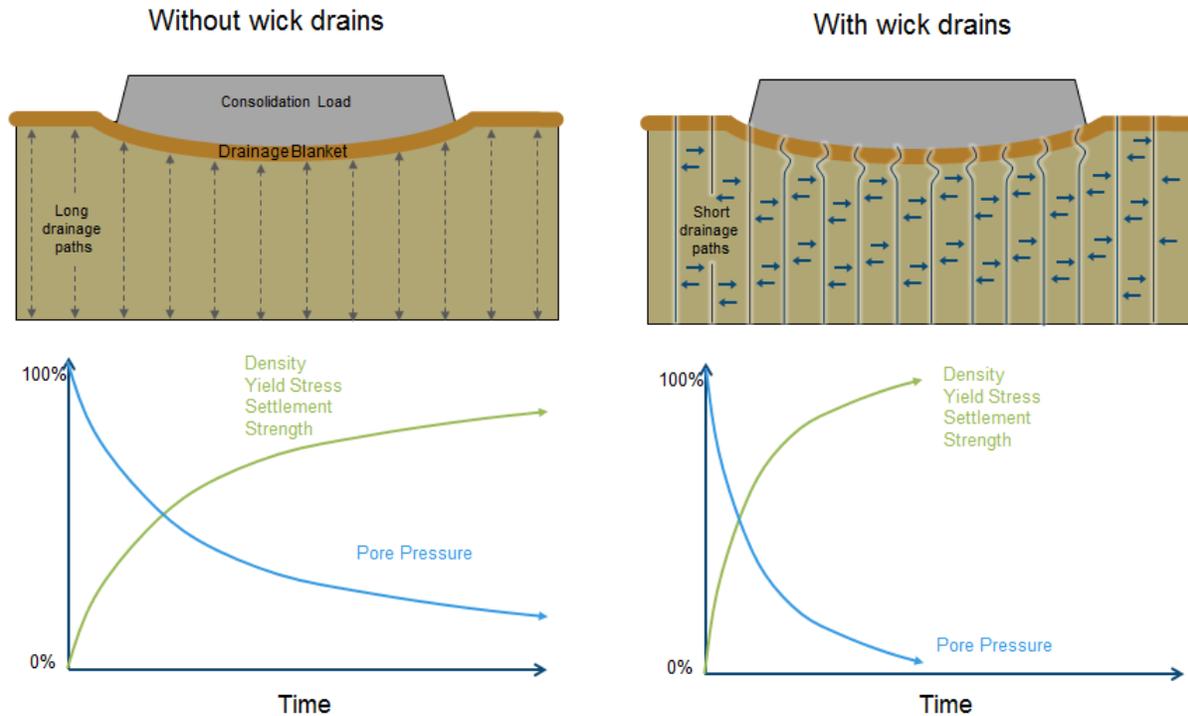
Schematic ground improvement technology consisting of a compressive load constructed over tailings amended with wick drains.
